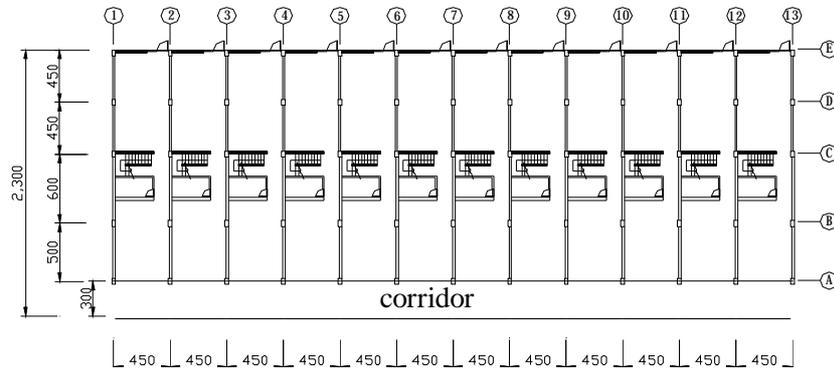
Plan of Ground Story of Row Street Building at In-Lin County
